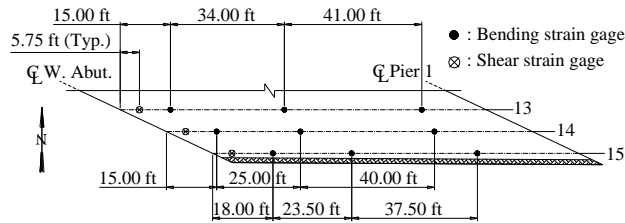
Bending and shear strain gage layout shown on plan view of south-west corner [1 ft = 0.3048 m]
